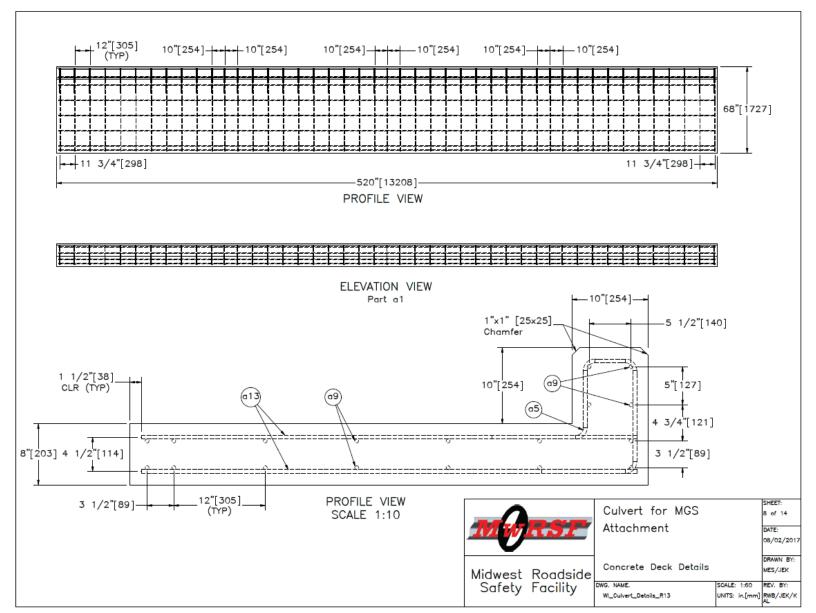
Concrete Top Slab Details, Test Nos. CMGS-1 and CMGS-2
